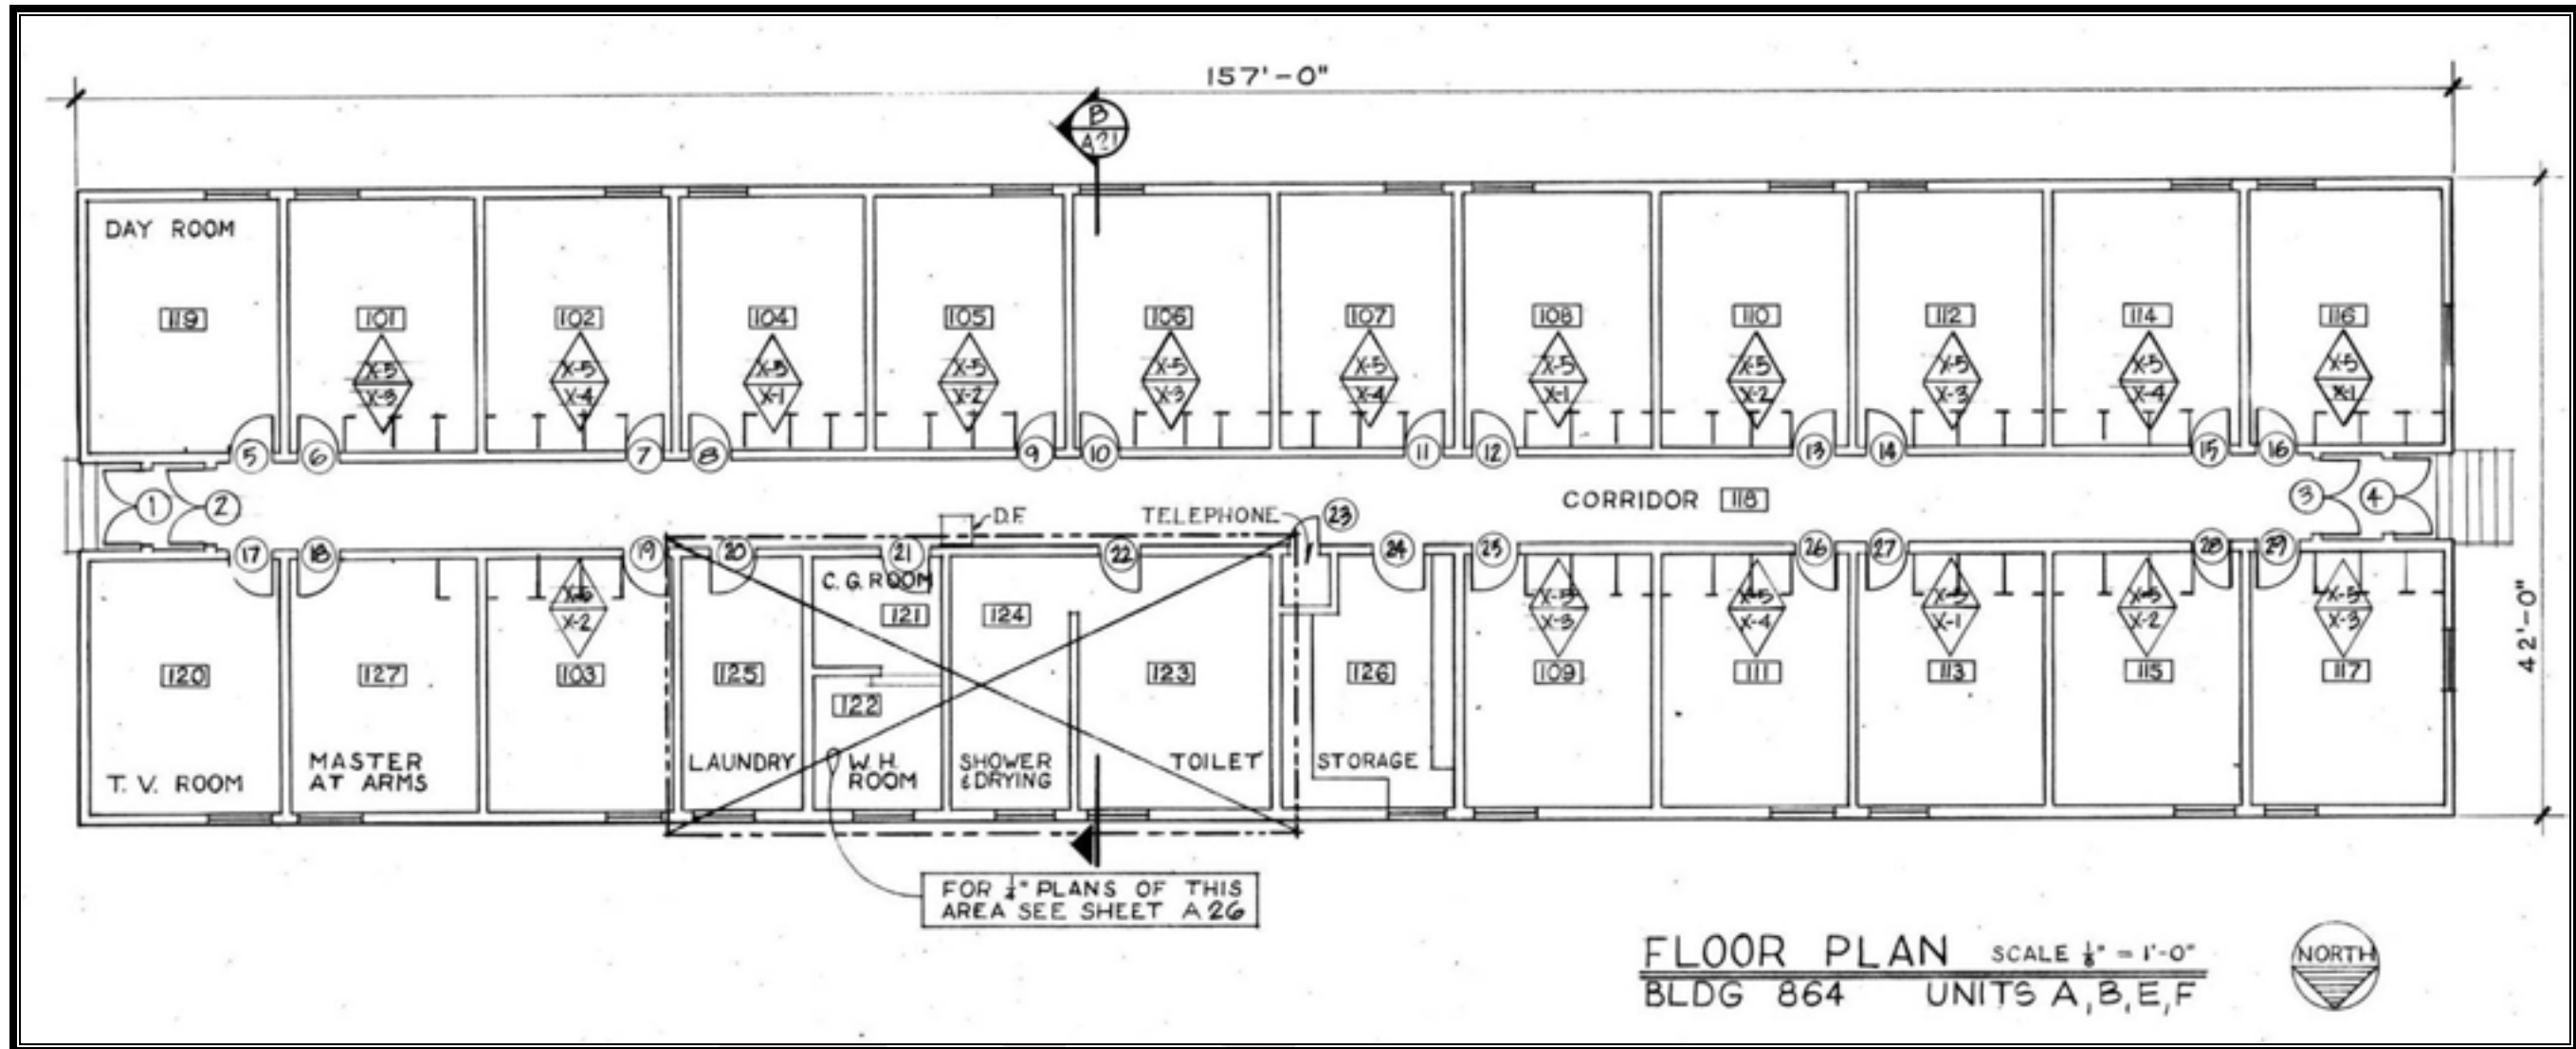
Building 864, 1968 (Courtesy Naval Air Station North Island)
